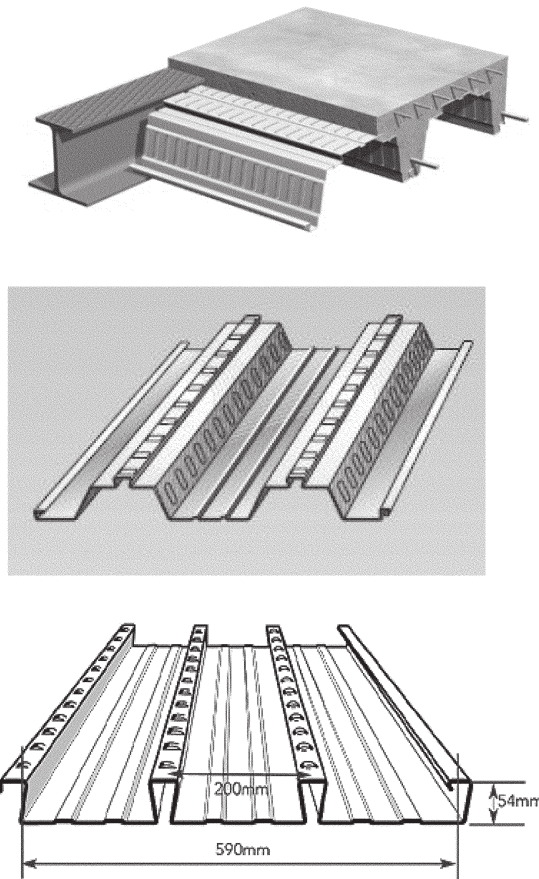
Composite floors. (Note: 1 mm = 0.04 in.)
